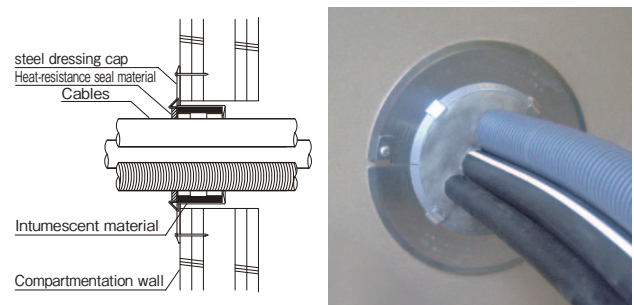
Construction of PUCHIROKUWIDE (for wall).
